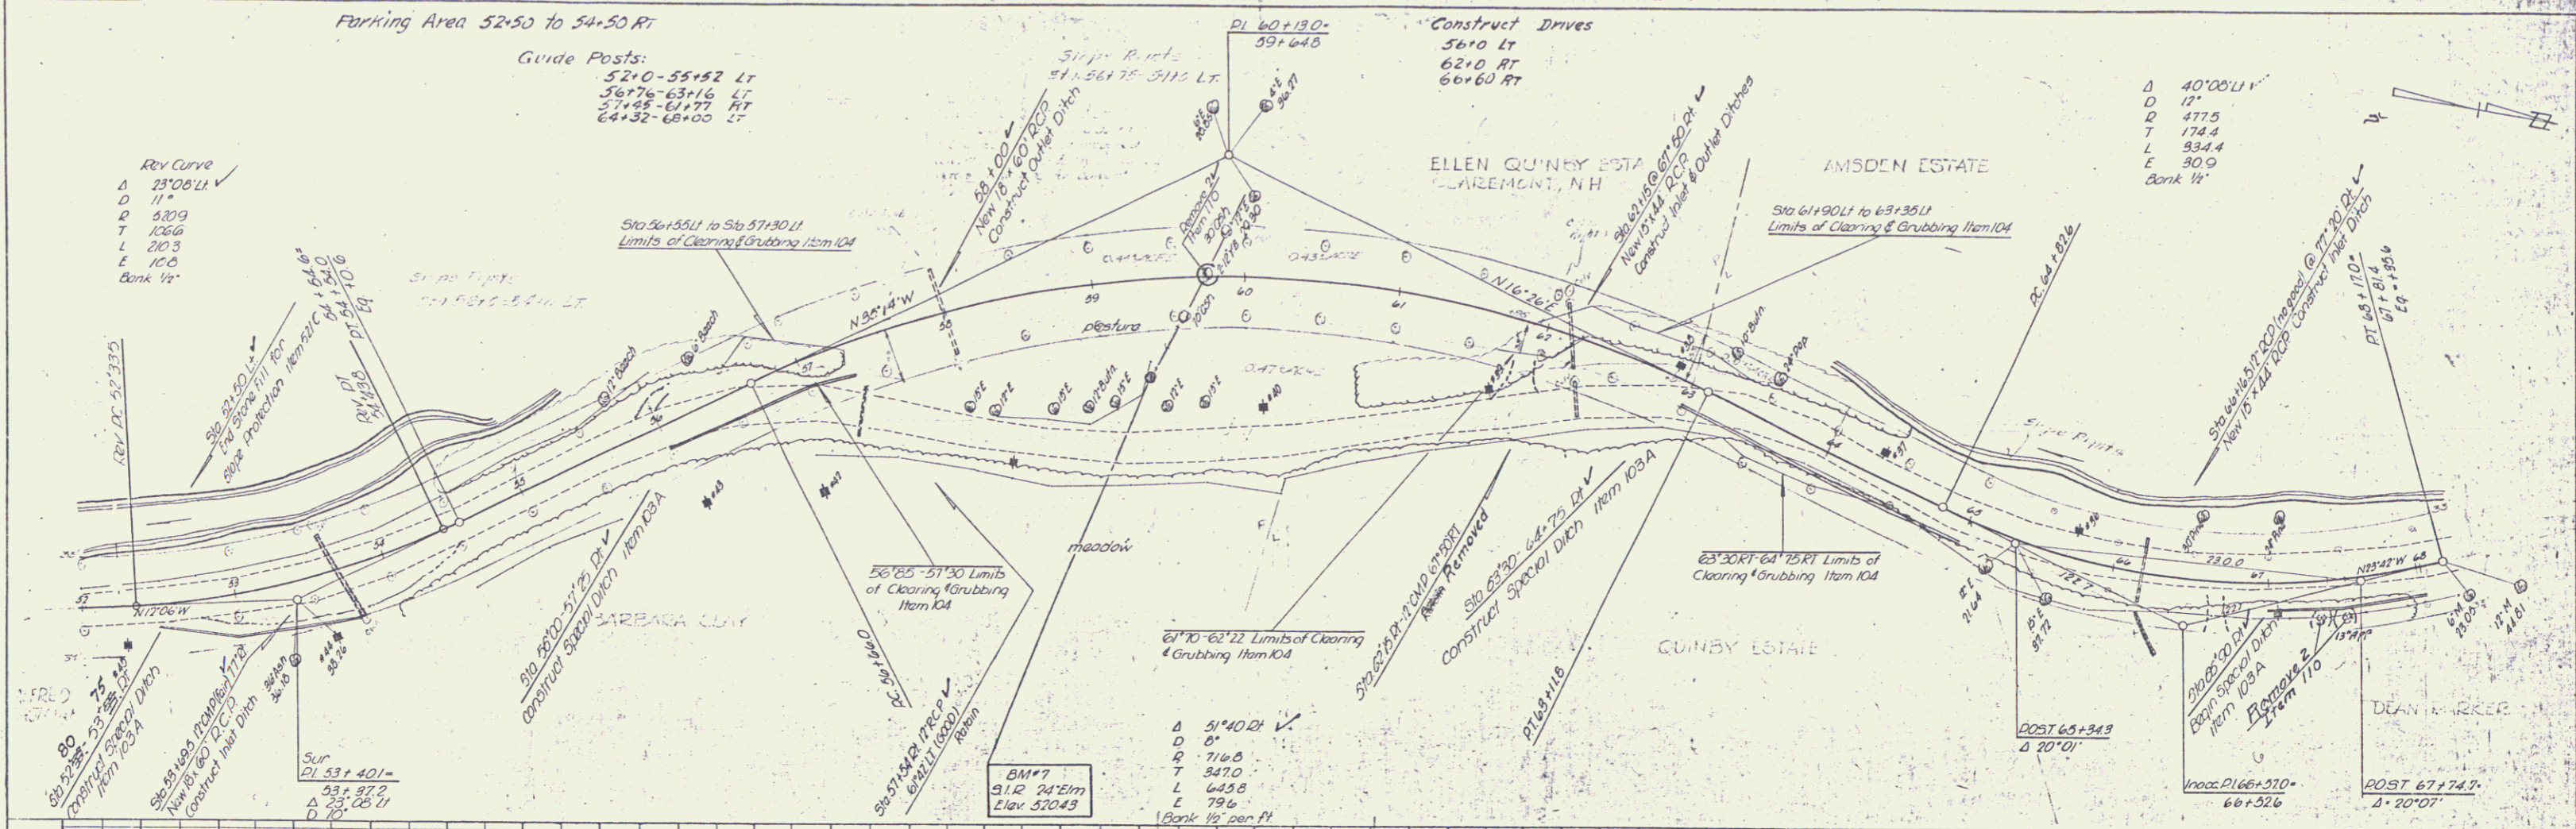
PLAN - PROFILE & P&E STANDARD
